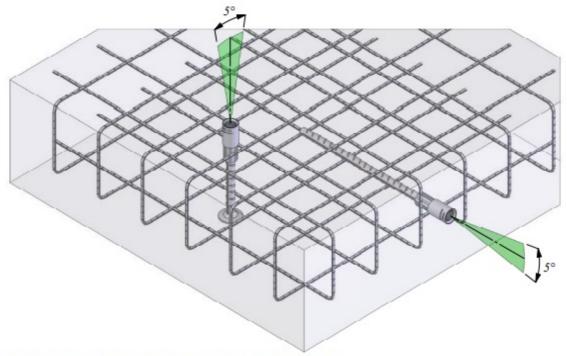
Angle tolerances for installation of Peikko Lifting Systems.
